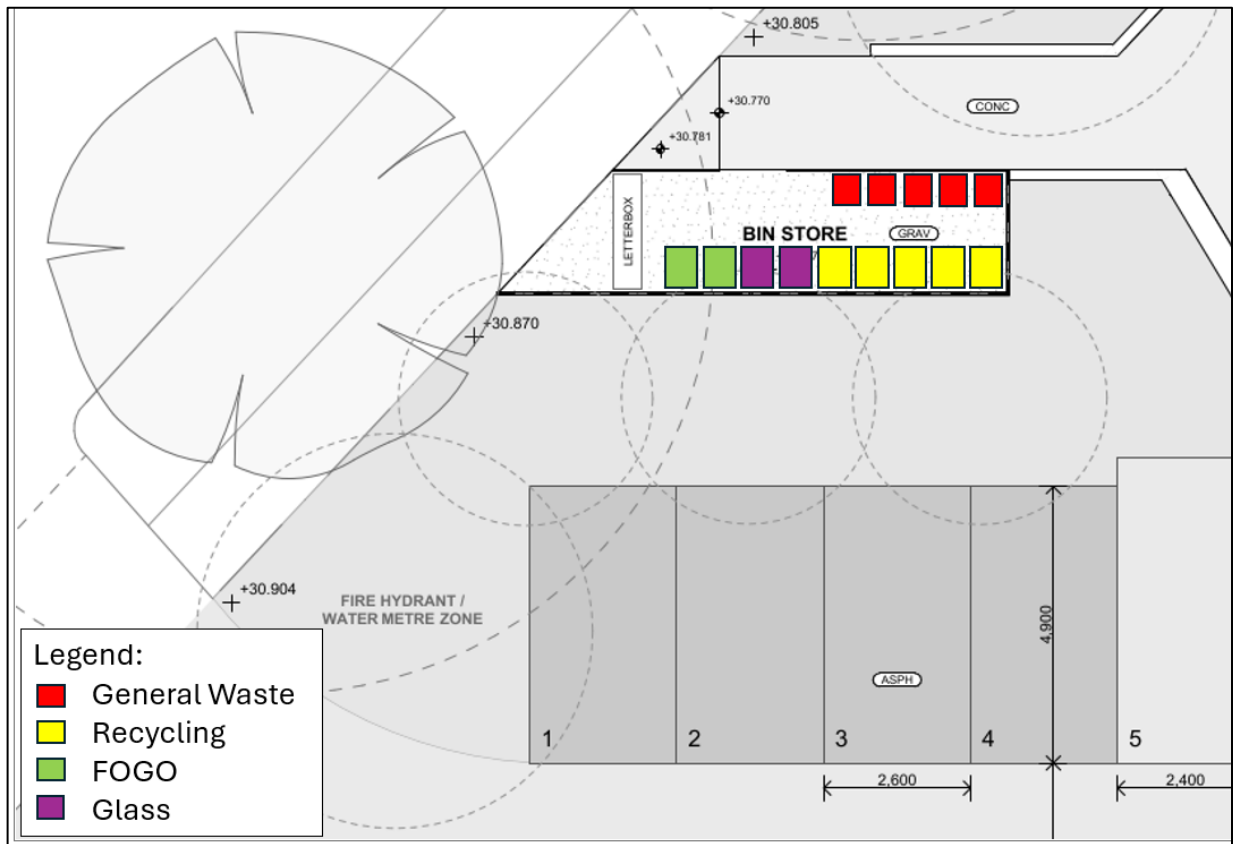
BIN STORAGE PLAN – FOUR BIN SYSTEM (FUTURE)
